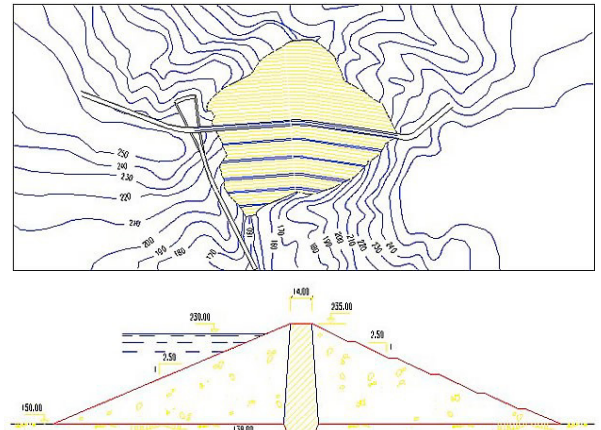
Plant and cross section of La Viñuela dam. (Source:²⁵).
